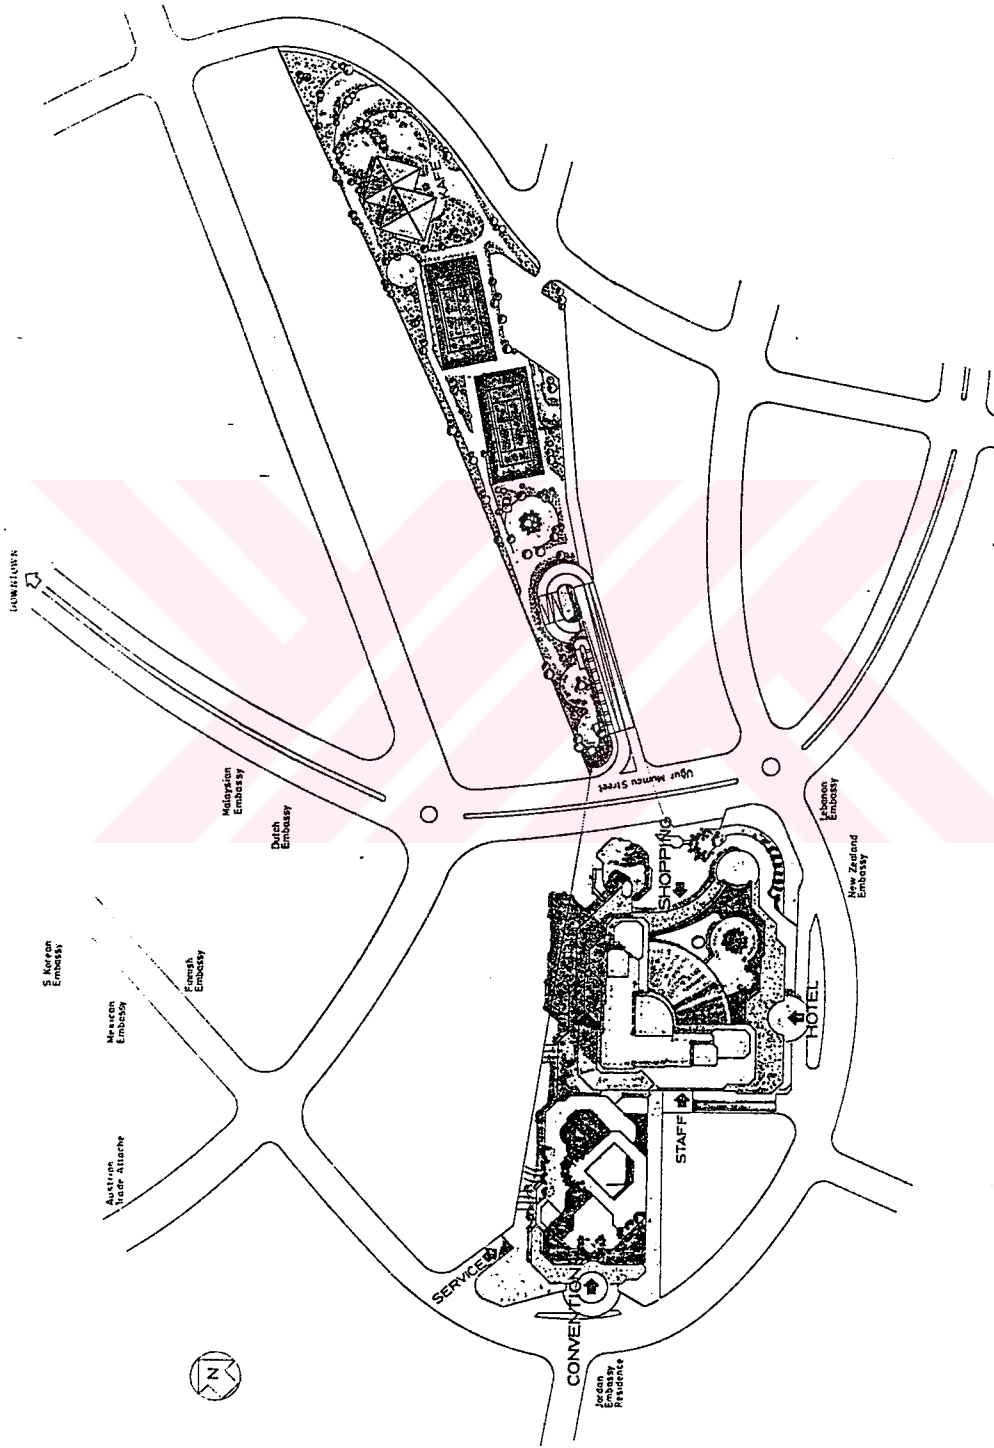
Çankaya Hotel Convention & Shopping Center, designed by Cemal Kayalar, Site Plan.
